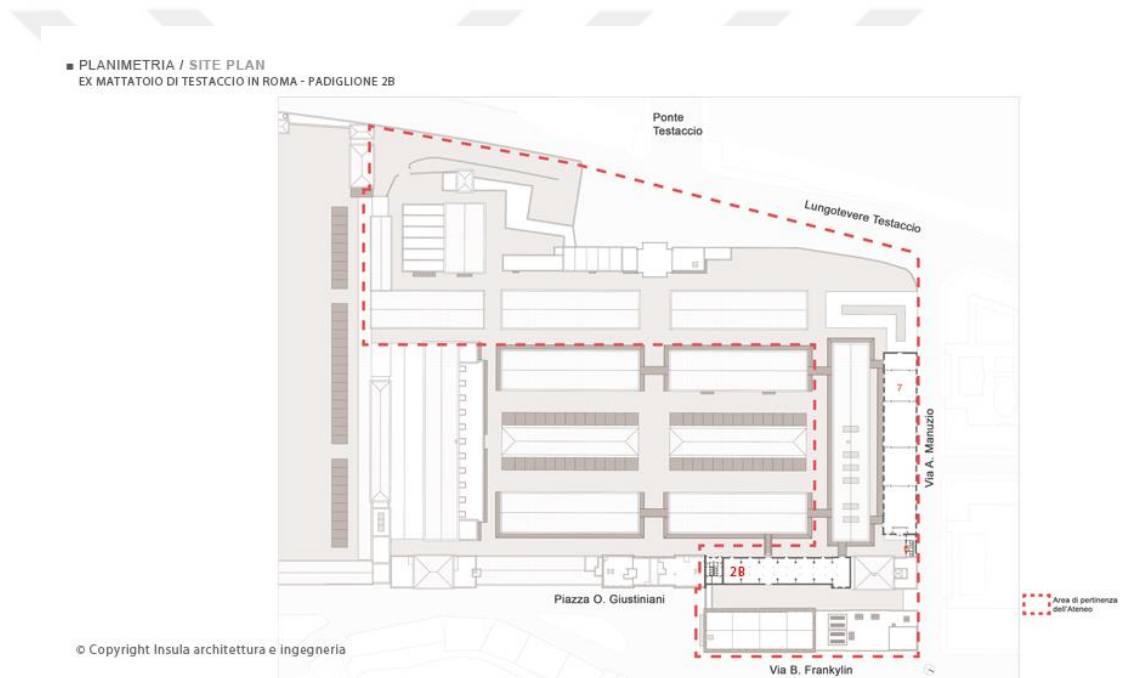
Plan of Rome slaughterhouse (Source: <https://www.theplan.it/eng/webzine/architettura-italiana/ex-mattatoio-al-testaccio-roma>)
